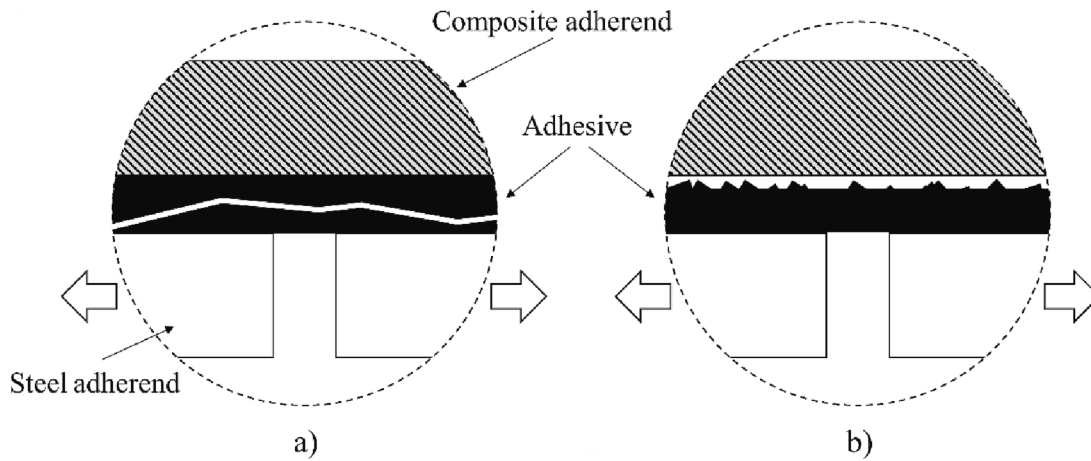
Magnified single shear test showing a) cohesion failure and b) adhesive failure.
